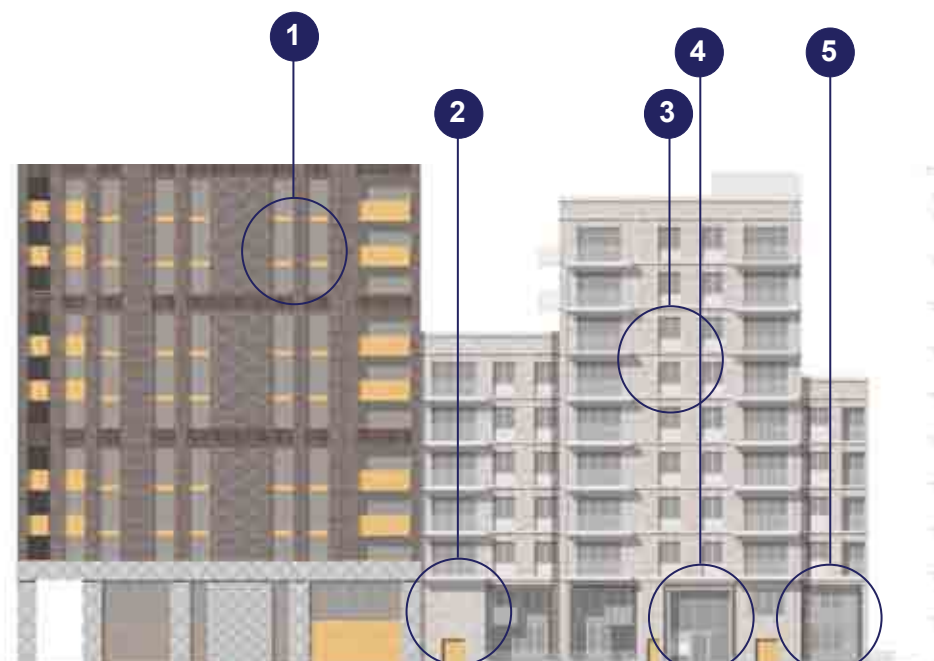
Block 4 South Elevation (Courtyard) Revised Planning Submission February 2015
